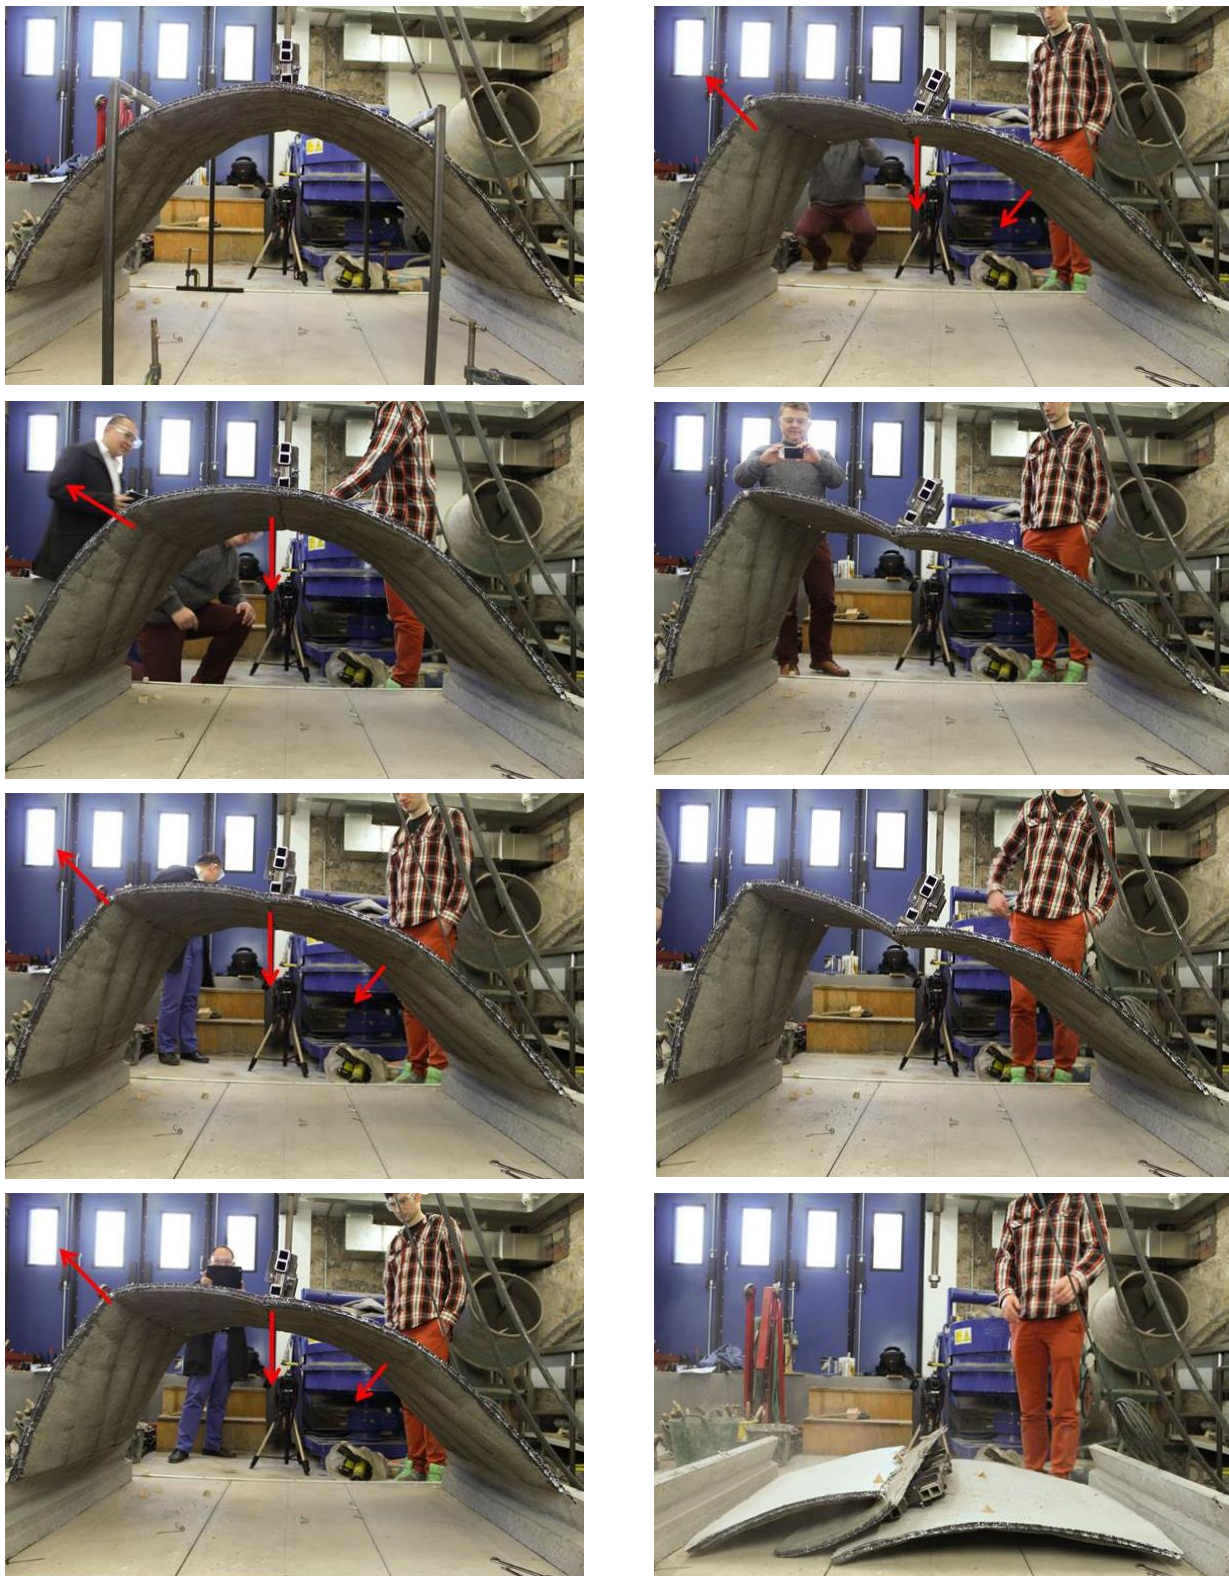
When the first major crack appeared at mid-span, the steel frames were removed to prevent hindering the collapse process. As Q2 started moving upwards and Q1 downwards - the entire shell leant towards Q2. It is noted that the shell continued to stand precariously as sections experienced slow ductile plastic collapse due to plastic reinforcements mixed into the concrete.
